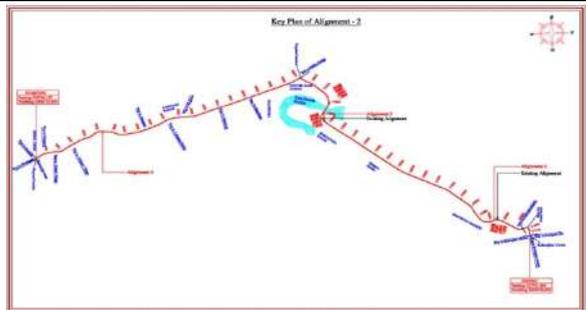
Existing road alignment from Kokrajhar to Bilashipara
